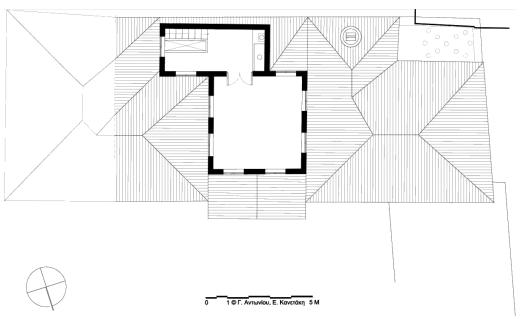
Roof plan with the attic Source: G. Antoniou, 2016
